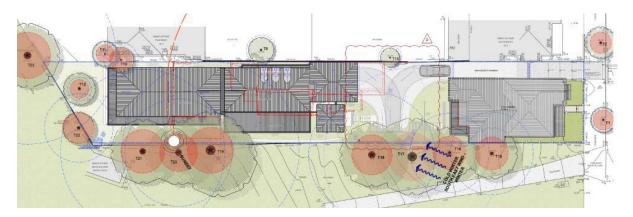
Site plan – existing dwelling (Dwelling 1) to right of image, proposed new dwelling (Dwelling 2) to left of image
